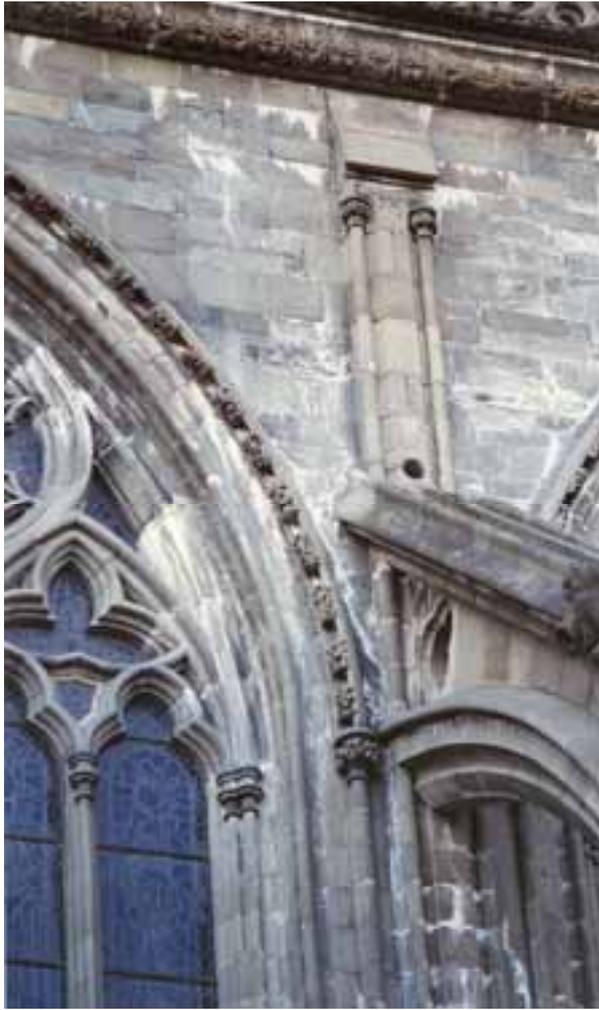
The clerestory wall of the nave's north side. Extensive salt efflorescences and calcite crusts cover the wall (photo: PS 5/97).
